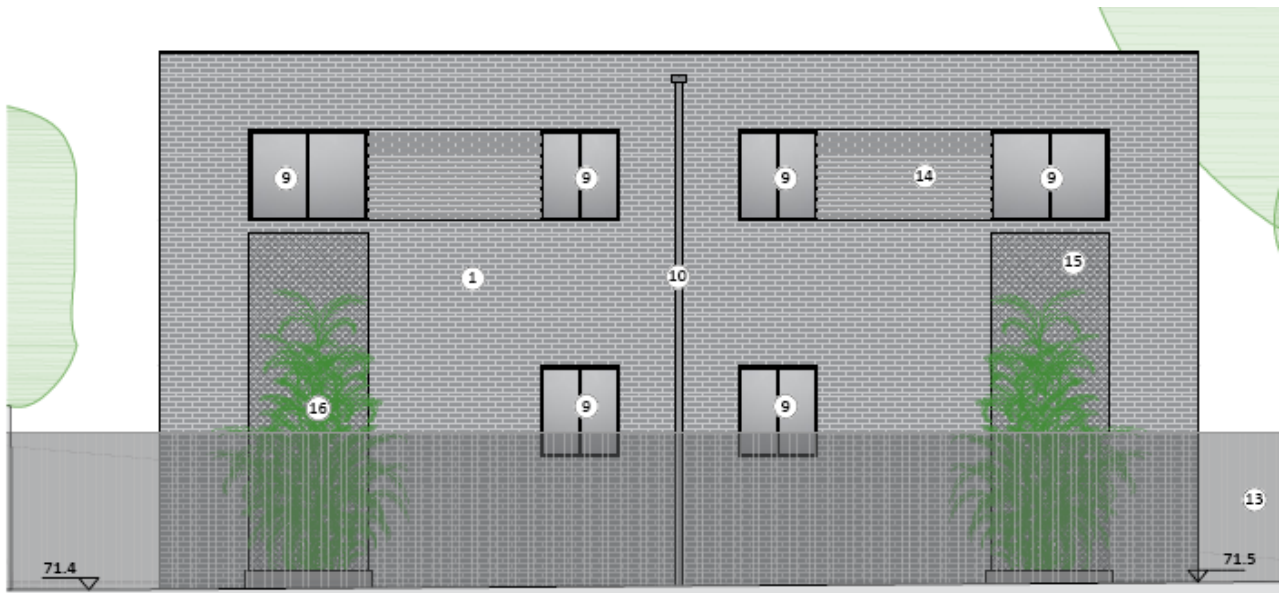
Refused rear elevation of planning application 16/00018/FUL.
